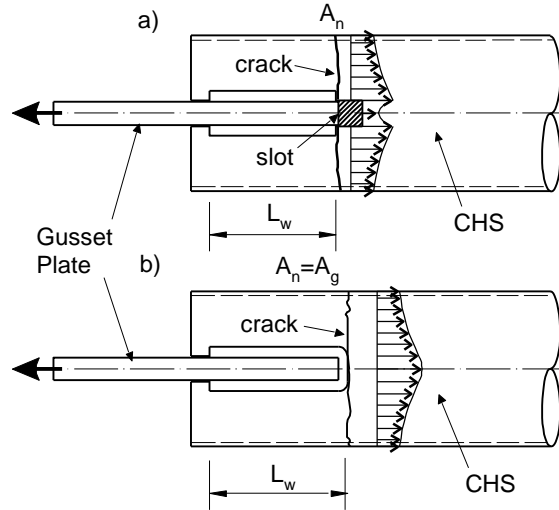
Gusset plate-to-slotted CHS joints: Circumferential failure (CF) with a) longitudinal welds only and b) with longitudinal welds plus a weld return
